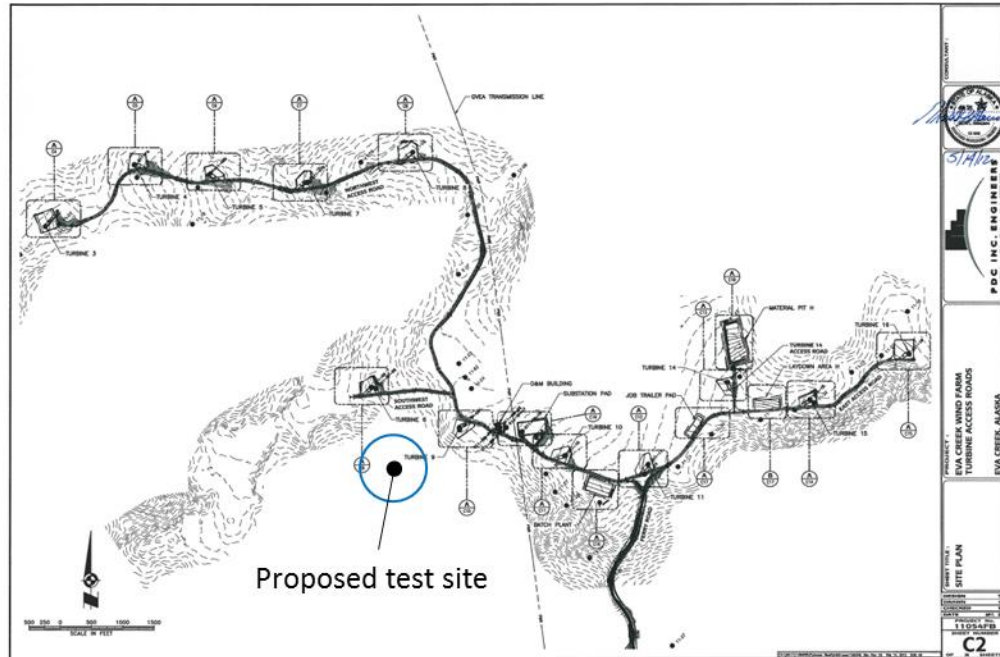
Layout of Eva Creek wind farm with proposed test site.
